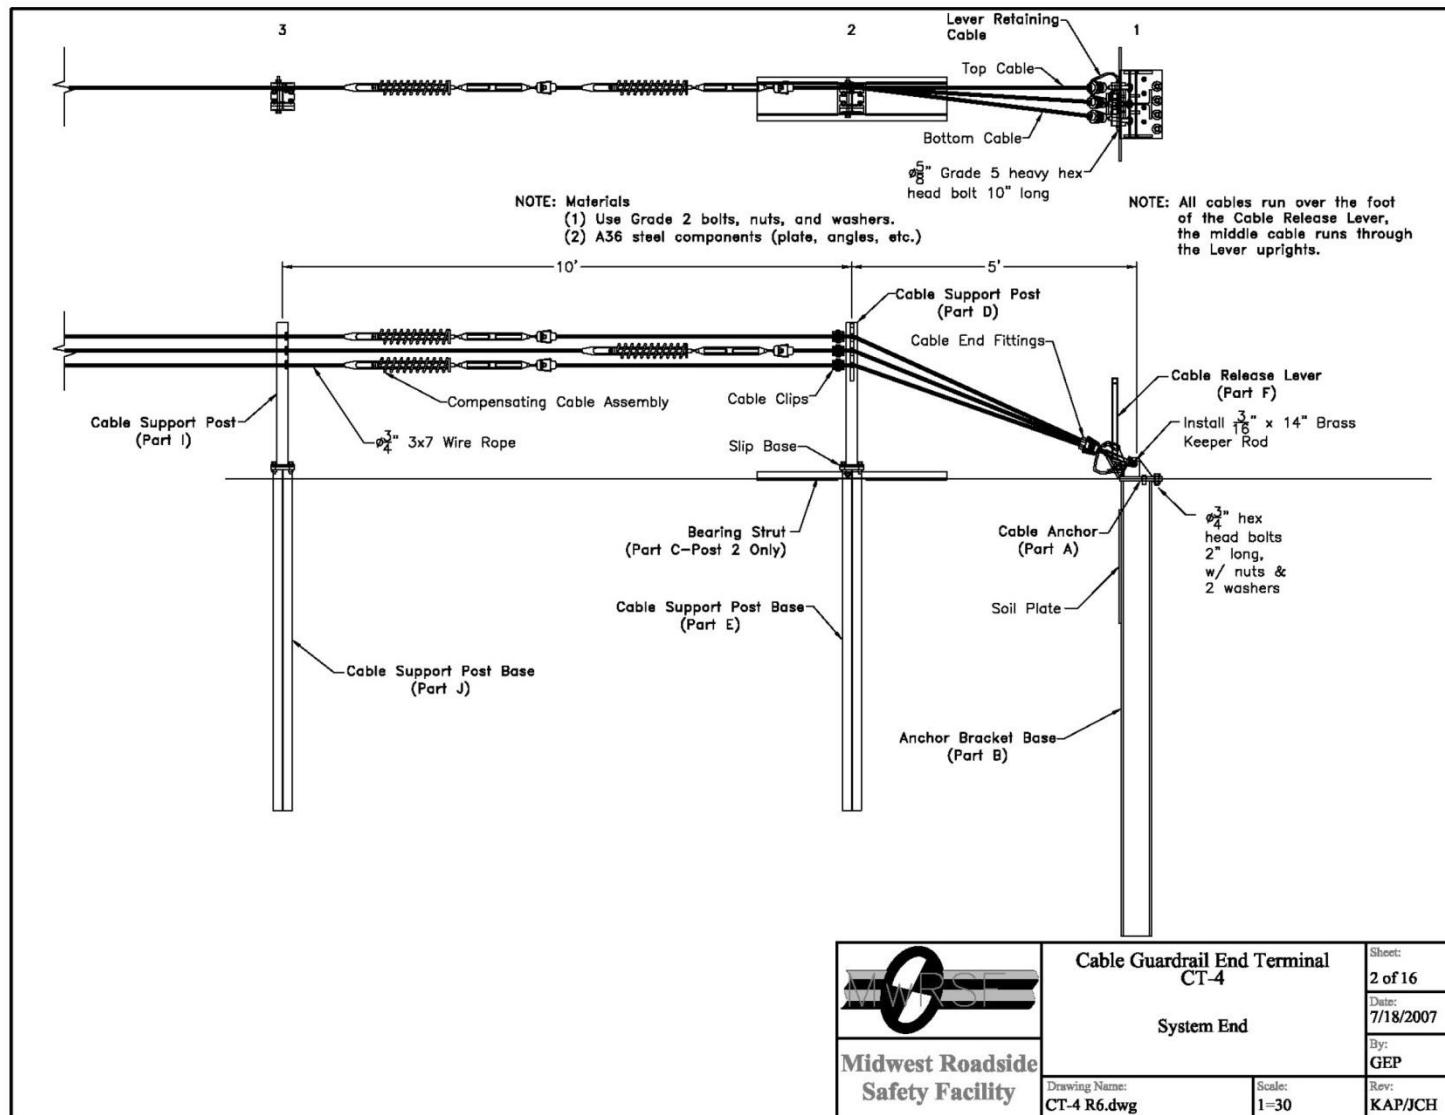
End Terminal Details, Cable Terminal Testing, 2000-2007 [65]
